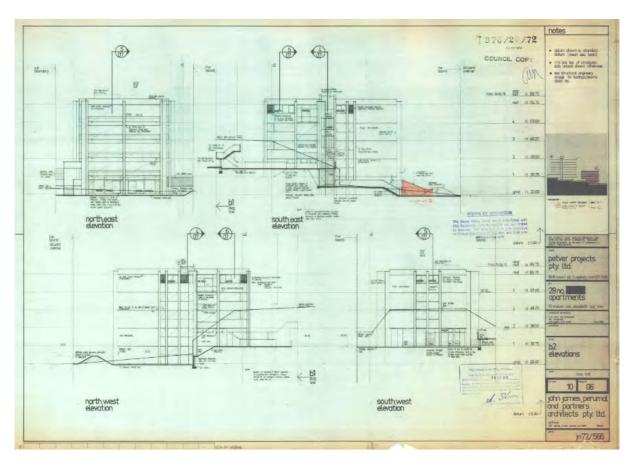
Submitted architectural drawings, Building 2 elevations, 1972. John James, Perumal and Partners Pty Ltd. (Source: City of Sydney Archives, A-00590018)
